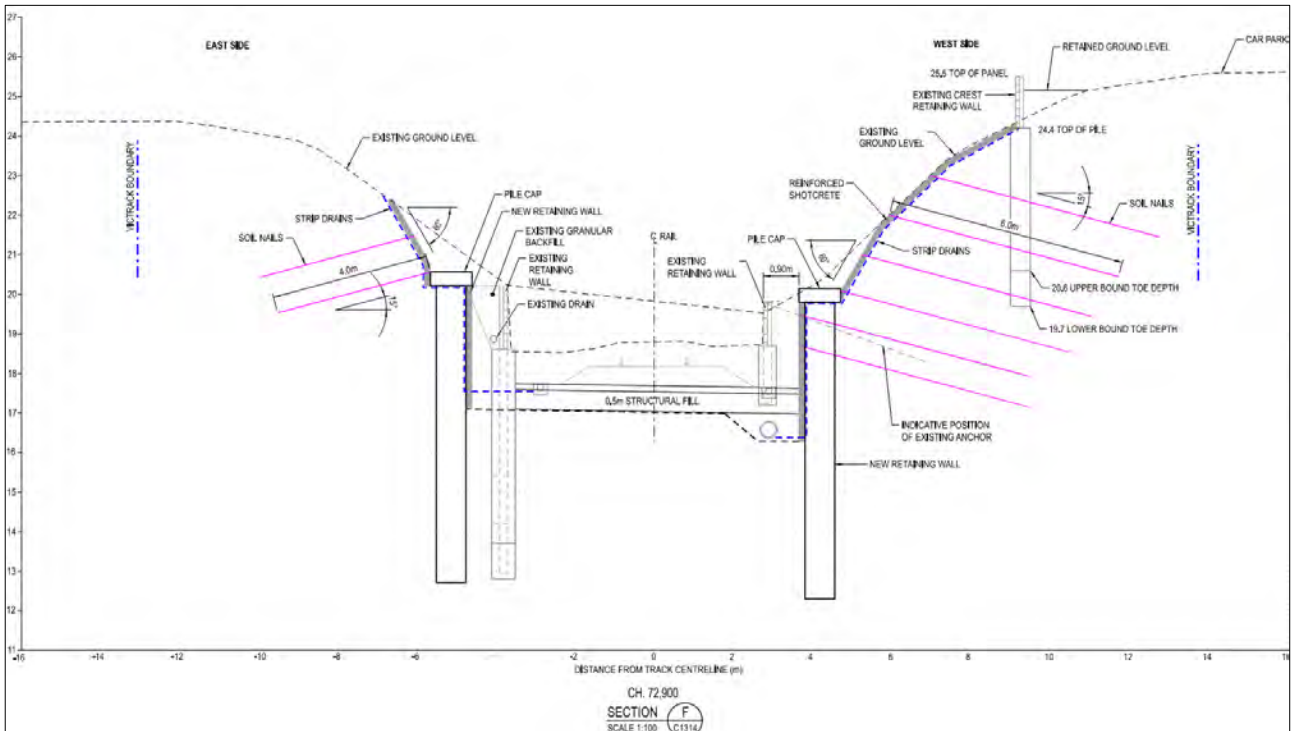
TYPICAL SECTION AT CH. 72.900 SHOWING RETAINING WORKS ON APPROCHES AT UP-END PORTAL (SOURCE: AURECON/VLINE)
